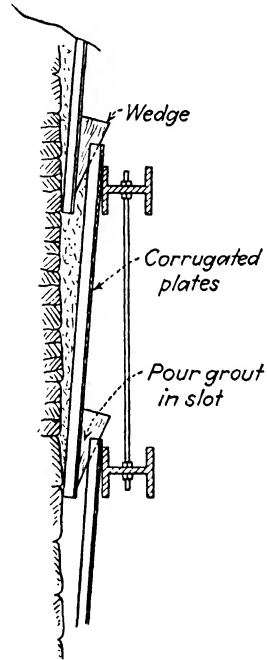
Corrugated iron plates used as shaft sheeting.
